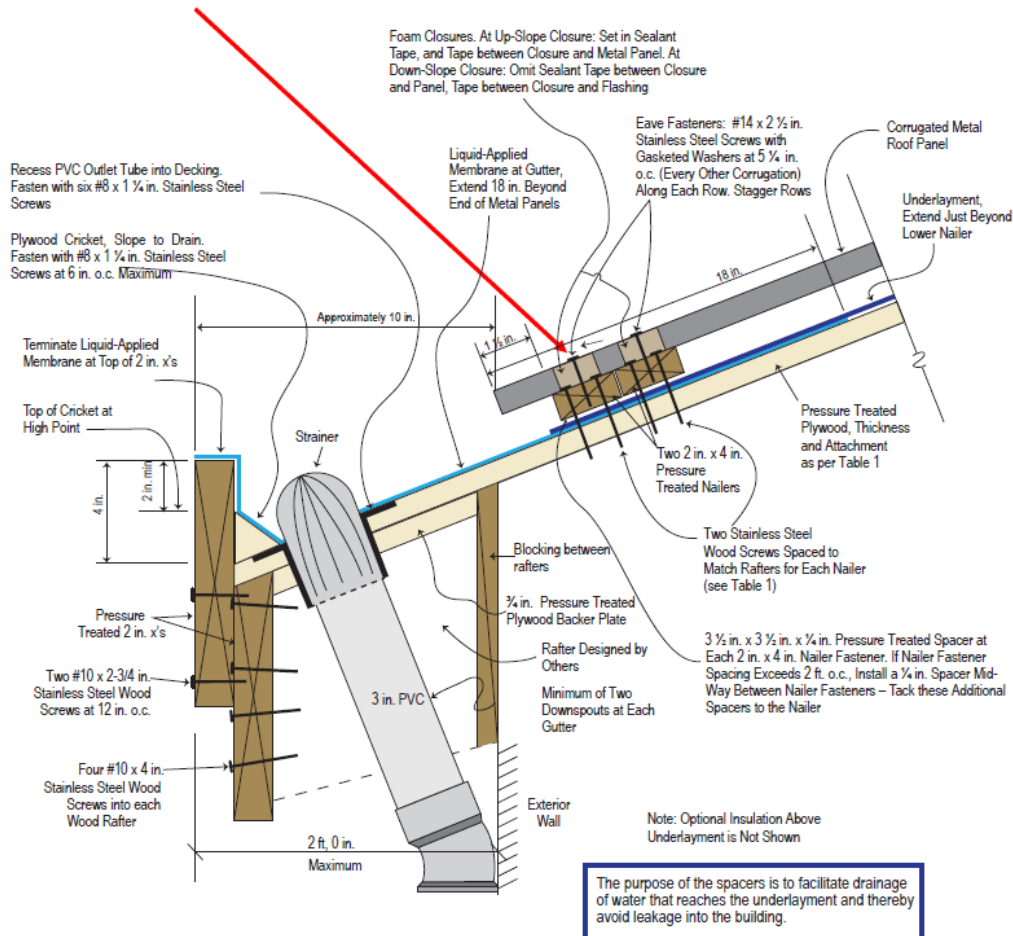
Roof edge detail showing extra fasteners and fastener arrangement at roof edge.
